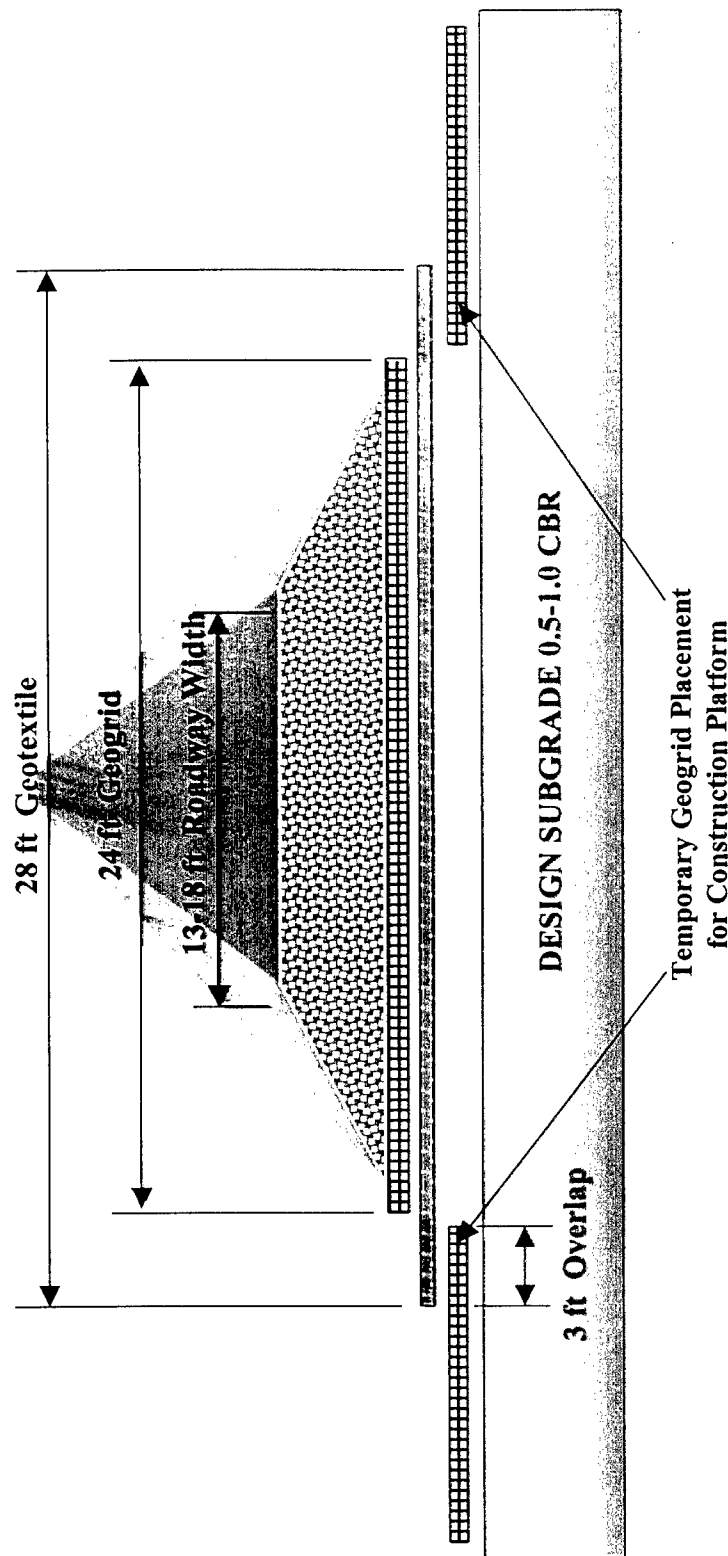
Typical cross section showing geogrid/geotextile placement for traffic Lane 2
